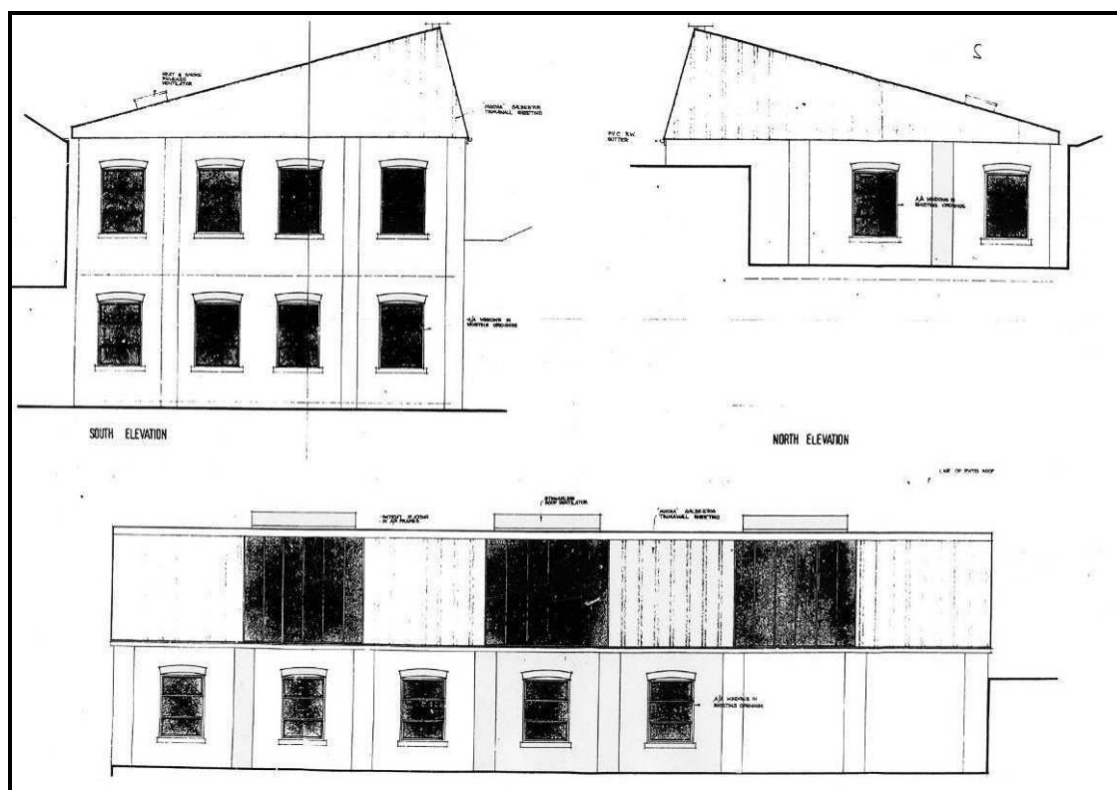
New roof for Building S in 1978 (City of Worcester Planning Application 78/1262)
